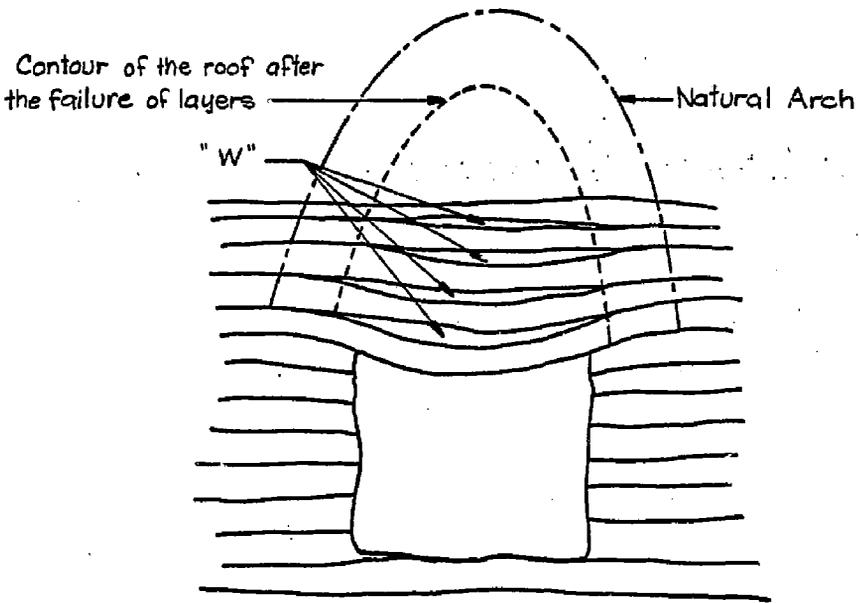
Weber's Cavities "W" in the Roof of an Opening in a Rock Salt Mine
